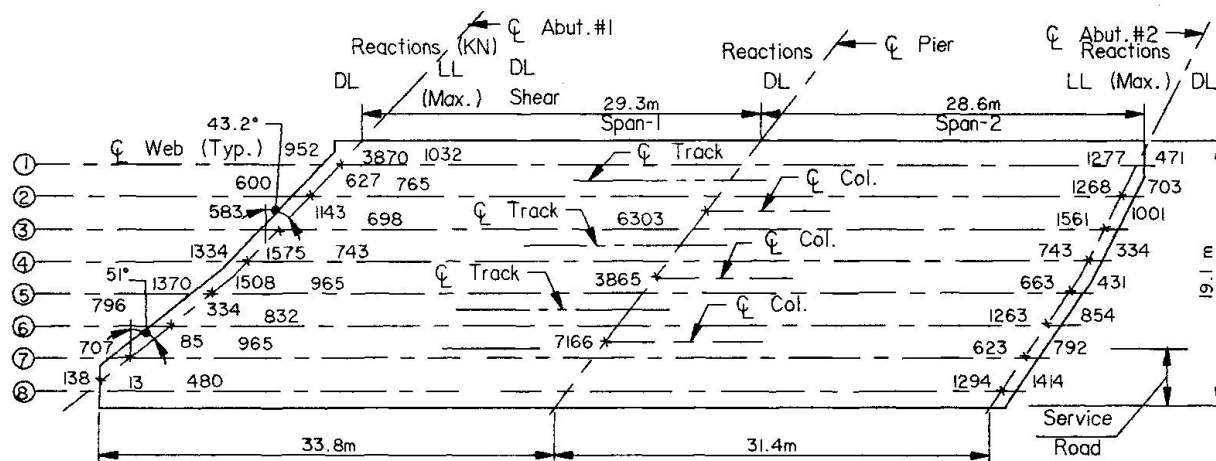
Sectional Framing Plan With Support Reactions - SPRR Bridge
